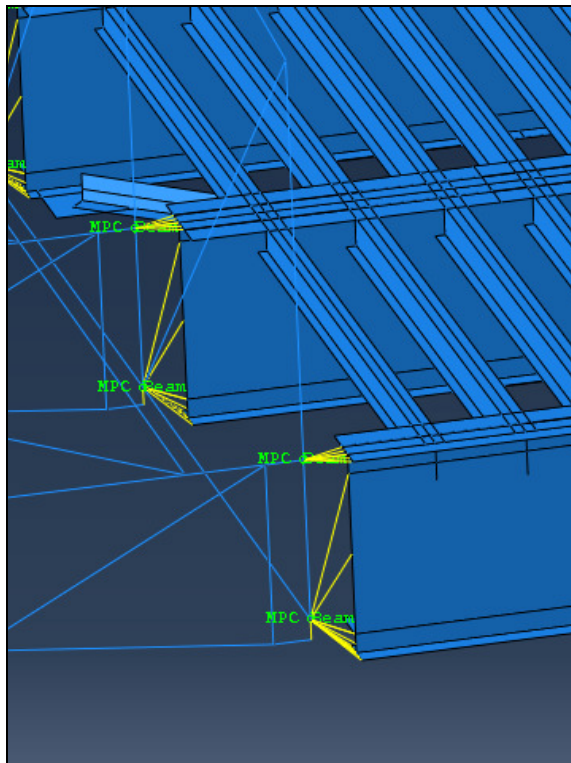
The figure shows Multi Point Constraints (MPCs) connections between the main girder and the transversal girders.
